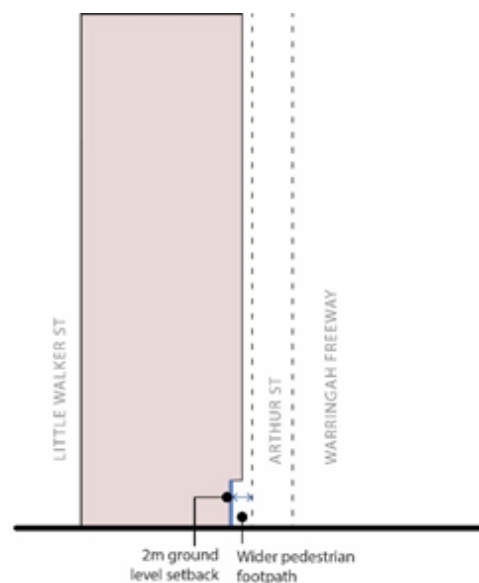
A: East-west section through 132 Arthur Street with 2m ground level setback
